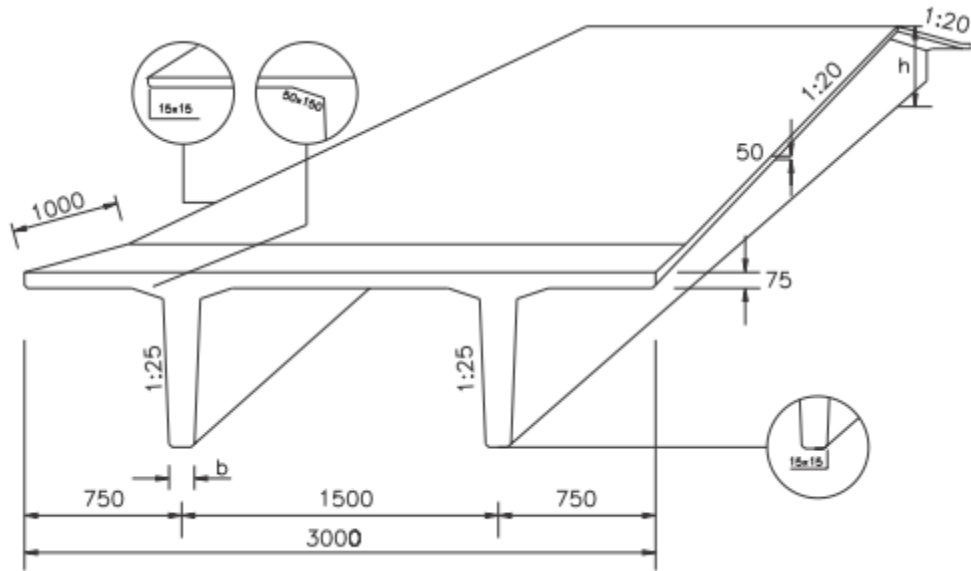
Typical Building Double Tee (Picture courtesy of Tekla Structures)
